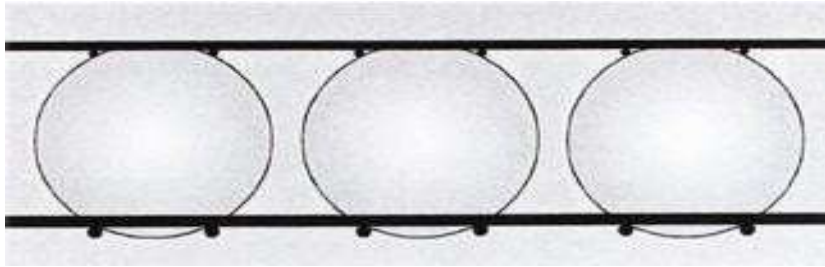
Simple Bubble Deck slab (Pre – cast)
